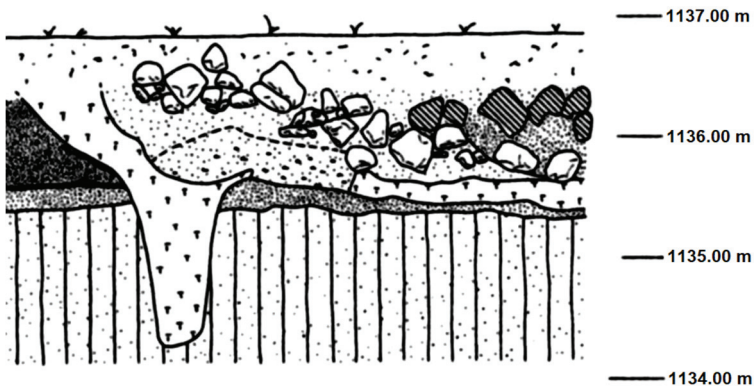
Cross-section of the rockfill dam through the spur ditch [38].
